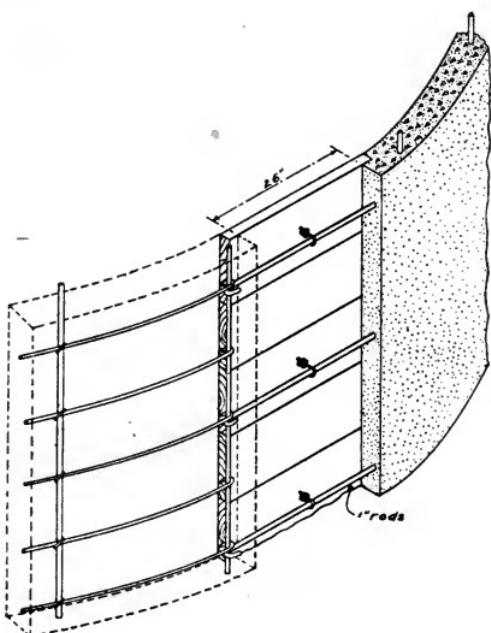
Continuous Doorway, with concrete jambs, showing manner of anchoring to the vertical reinforcing, and position of plank doors.
